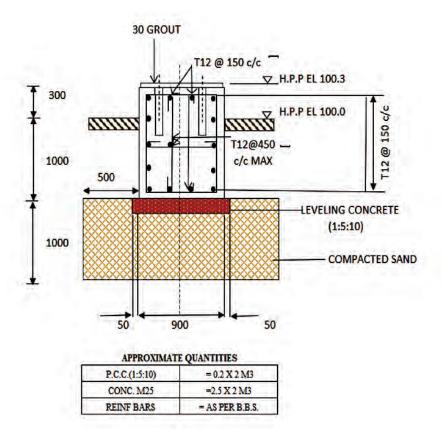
Elevation of Booster pump foundation (All dimensions are in mm)
